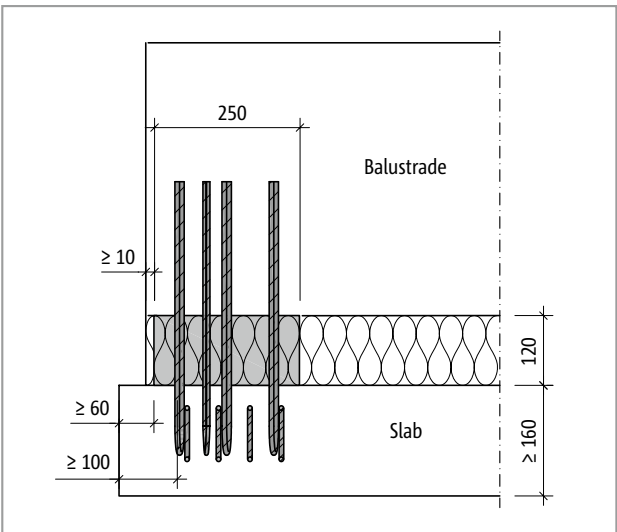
Schöck Isokorb® XT type A: View of edge spacings
